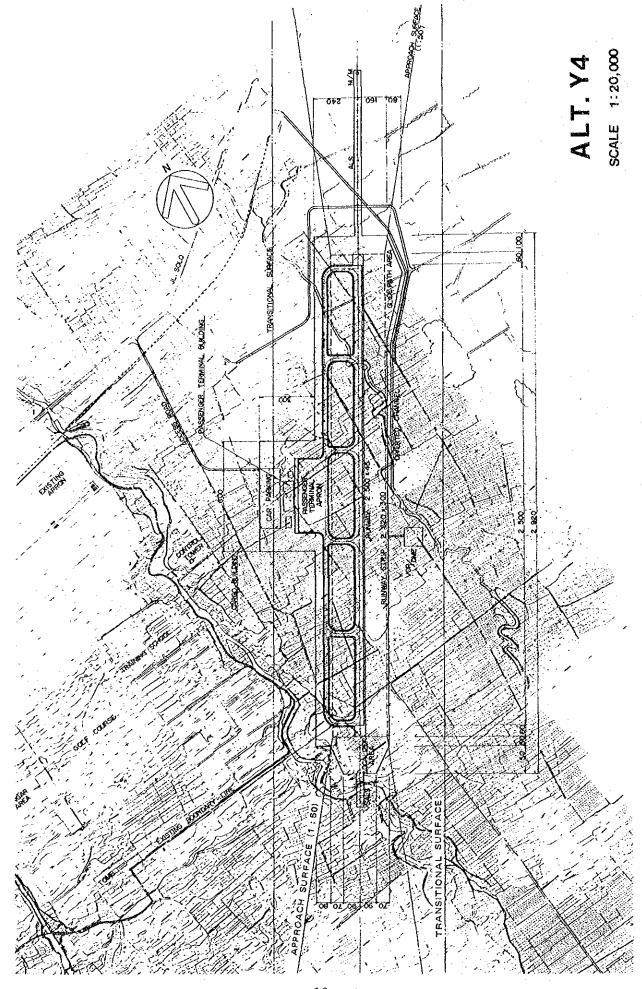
Airport Layout Plan - Yogyakarta Airport
